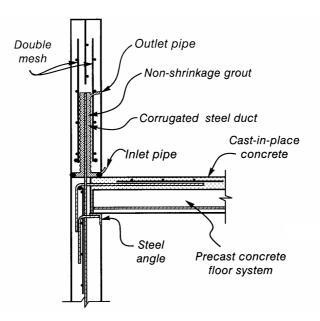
Exterior wall-floor slab connection detail: Partitioned wall with horizontal joint
